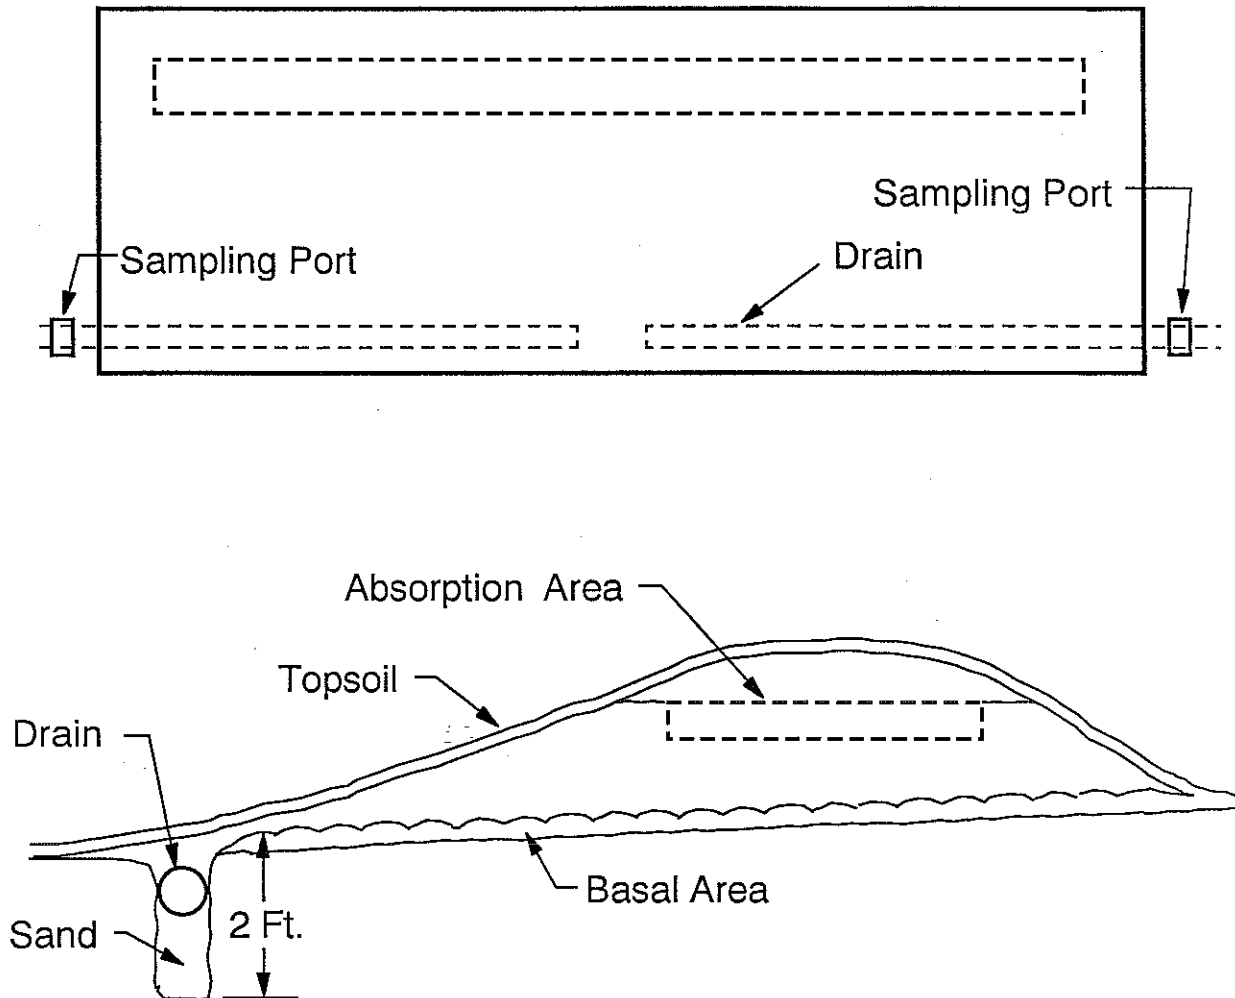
Plan view and cross section of mound showing a drain beneath the mound.
